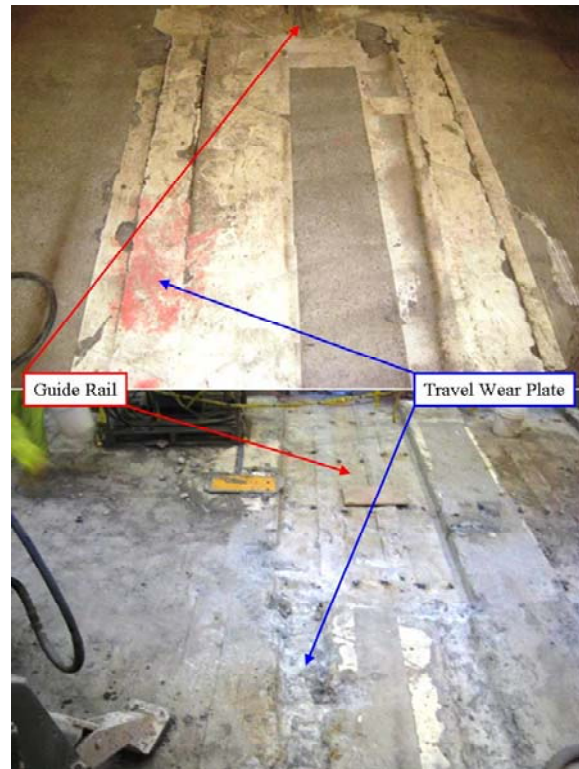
Example of major steel embed removal includes the guide and wear plates in place for the shield doors
